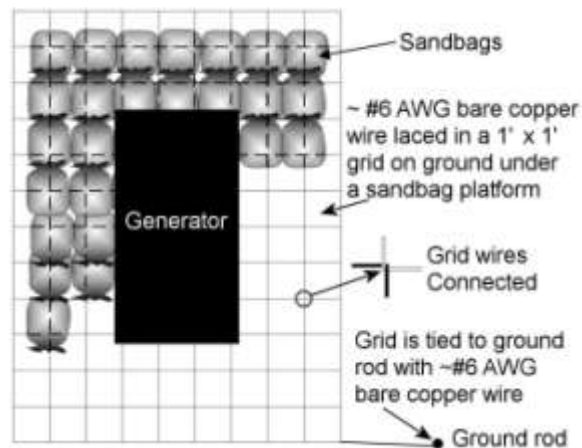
Typical Equipment Laced Wire Grounding Installation.
